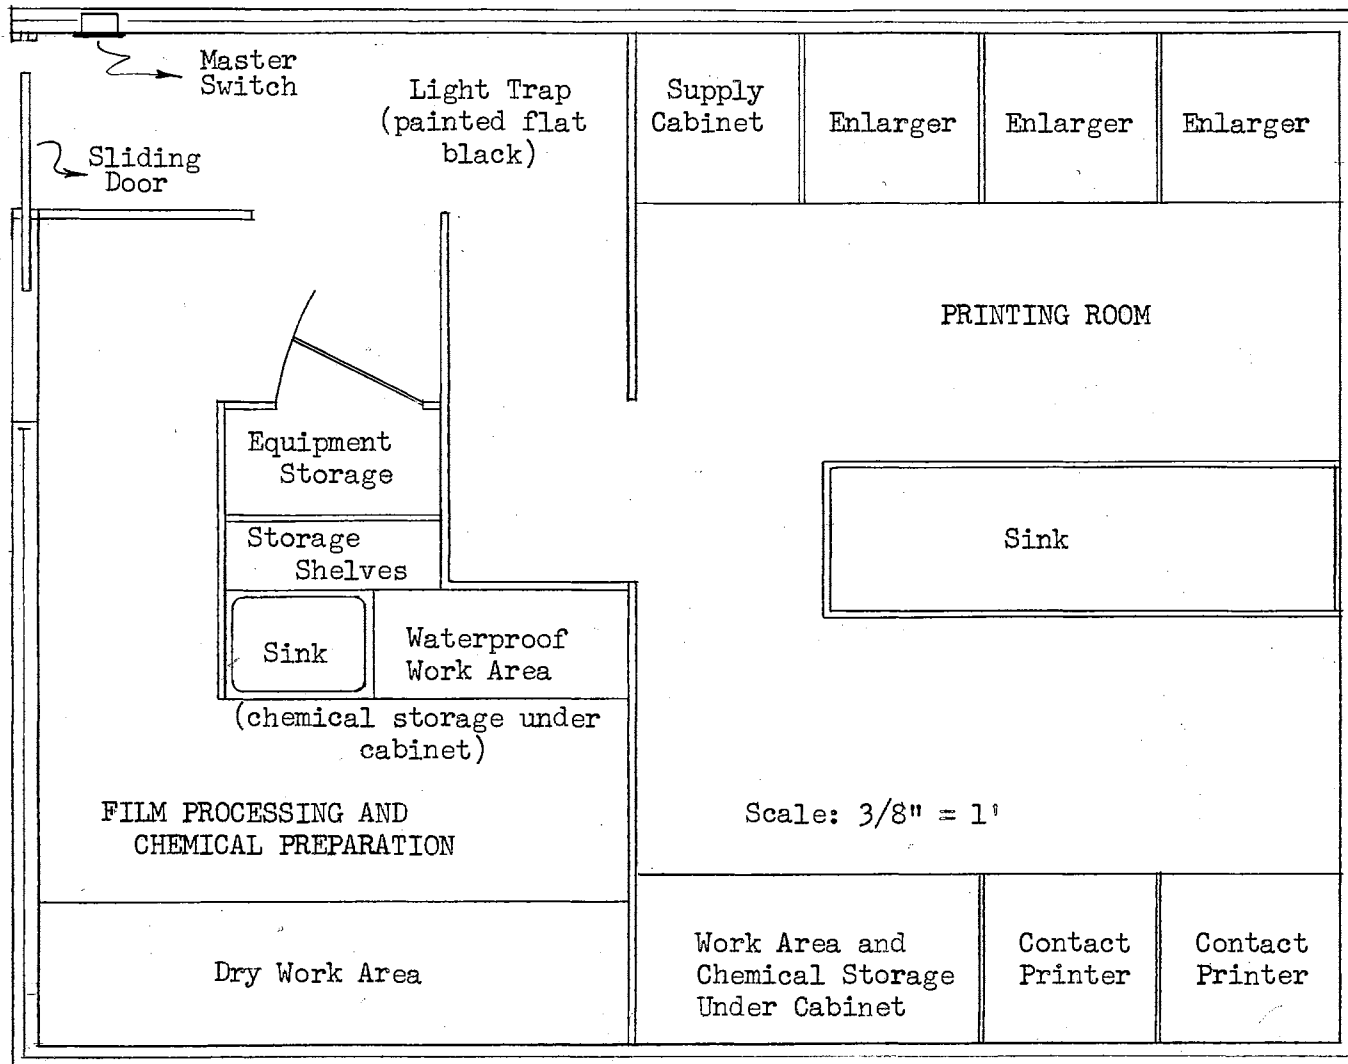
SUGGESTED PLAN FOR DARKROOM LAYOUT
